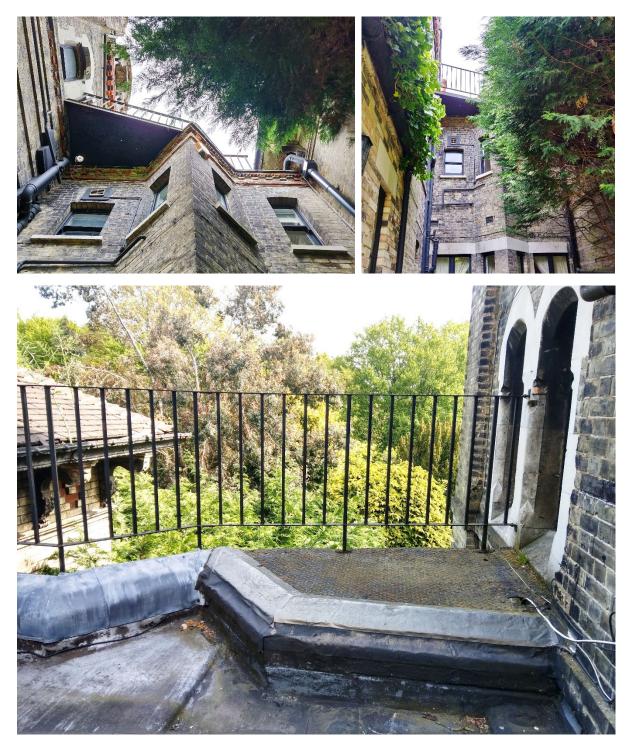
View of existing roof terrace access - a metal landing bridges across from a tower window onto the roof terrace, with railings fixed into the top of the parapet. Proposal – remove unsympathetic bridge and metal balustrading. Provide alternative roof and maintenance access from the rear of the tower, where it will be concealed from view. Replace balustrading with a more sympathetic design that will not detract from the front elevation, set at the lower level of the roof terrace.
